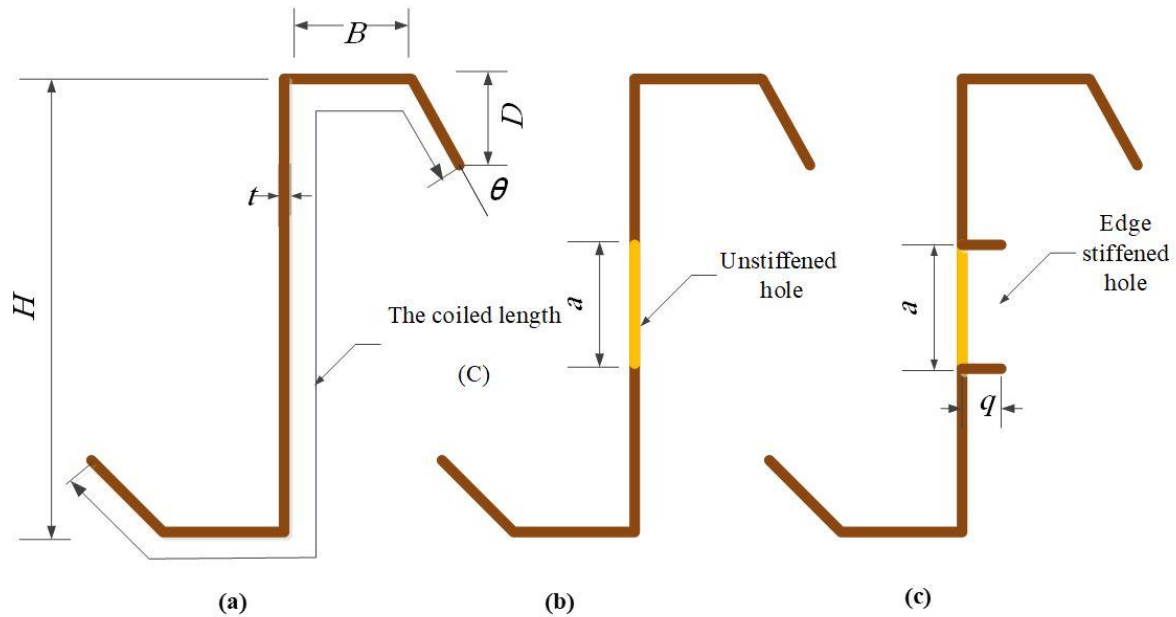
Finite element model dimensions (a: cross-section, b: unstiffened holes, c: Stiffened hole)
